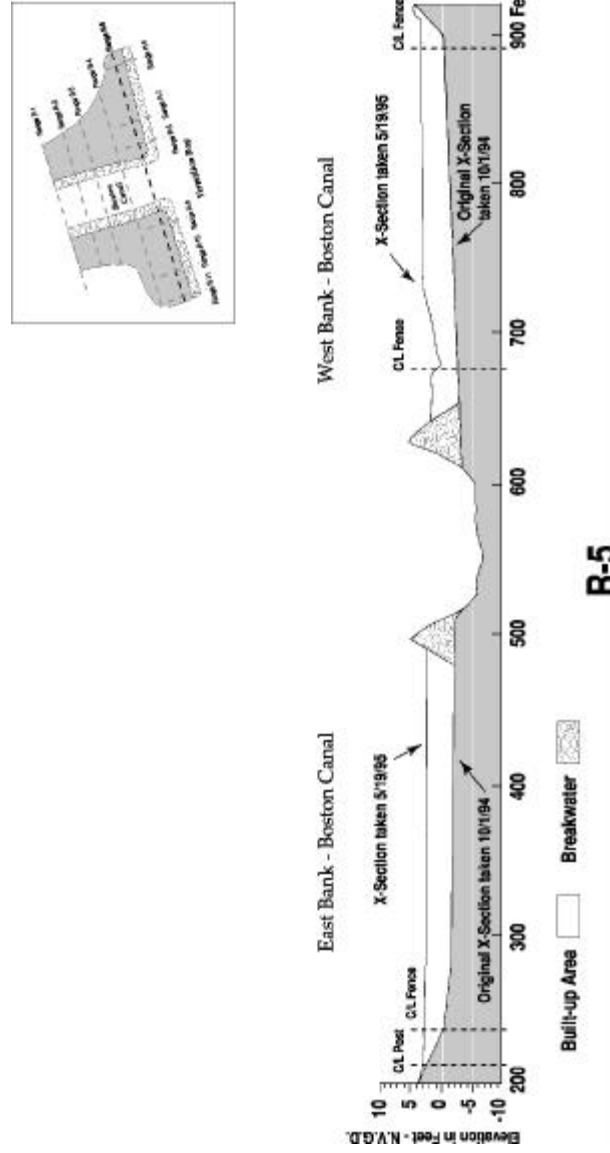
Boston Canal/Vermilion Bay Shoreline Protection (T/V-09) elevational profile of east-west transect R-5 showing accretion.
